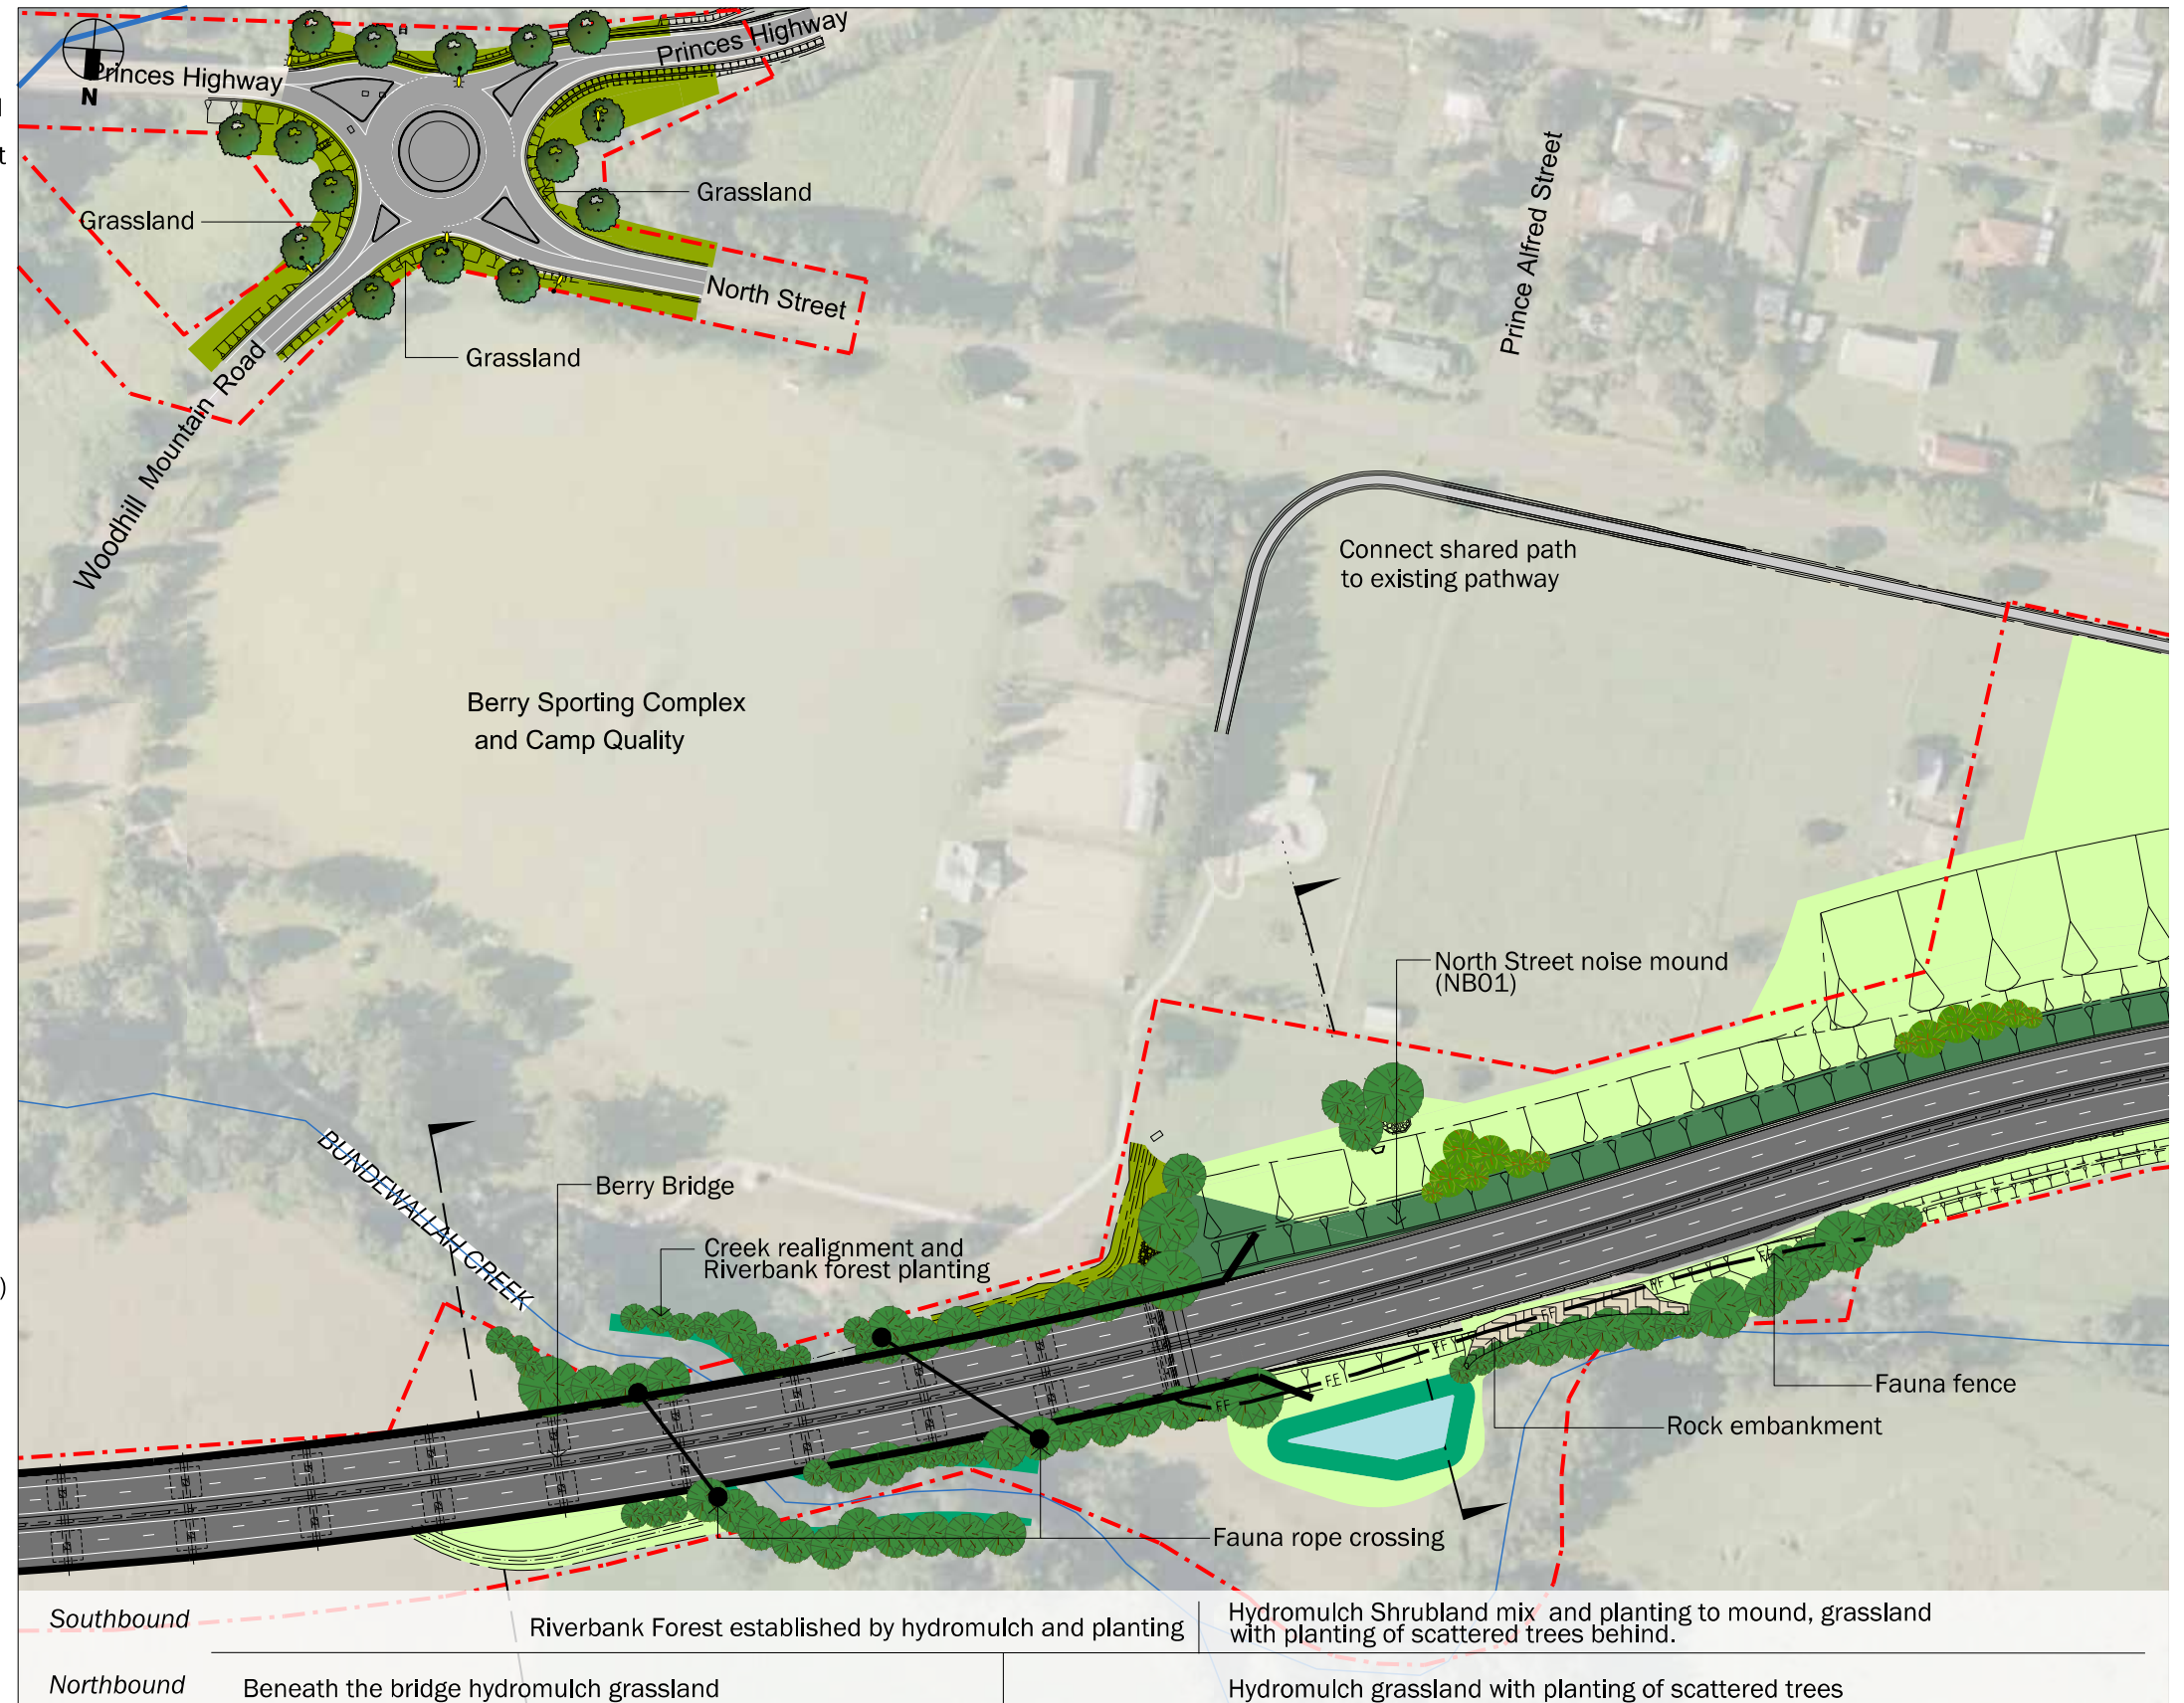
Urban and landscape design plan (Sheet 16) - Berry Character Zone
